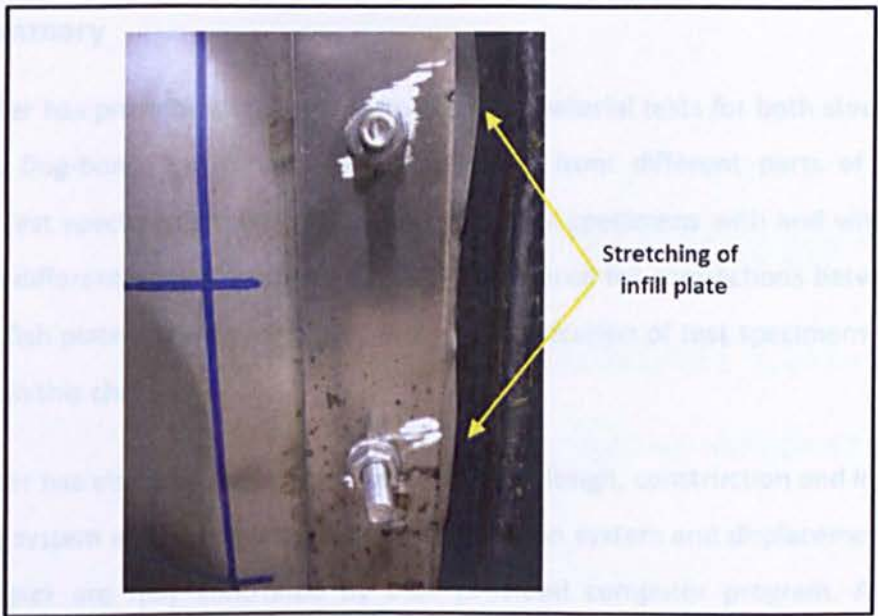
Premature stretching of steel plate at connections to the fish plates
